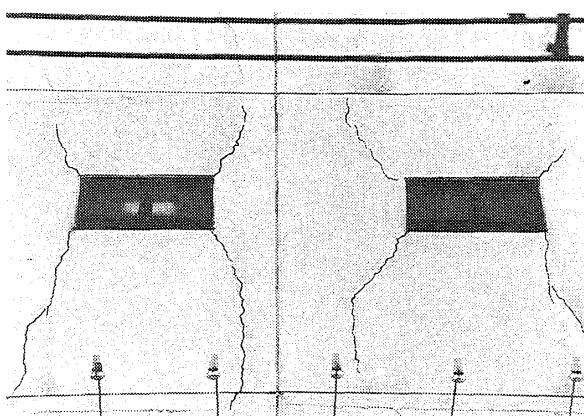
Cracking formed on the external wall of a building—Type A (window corner)
